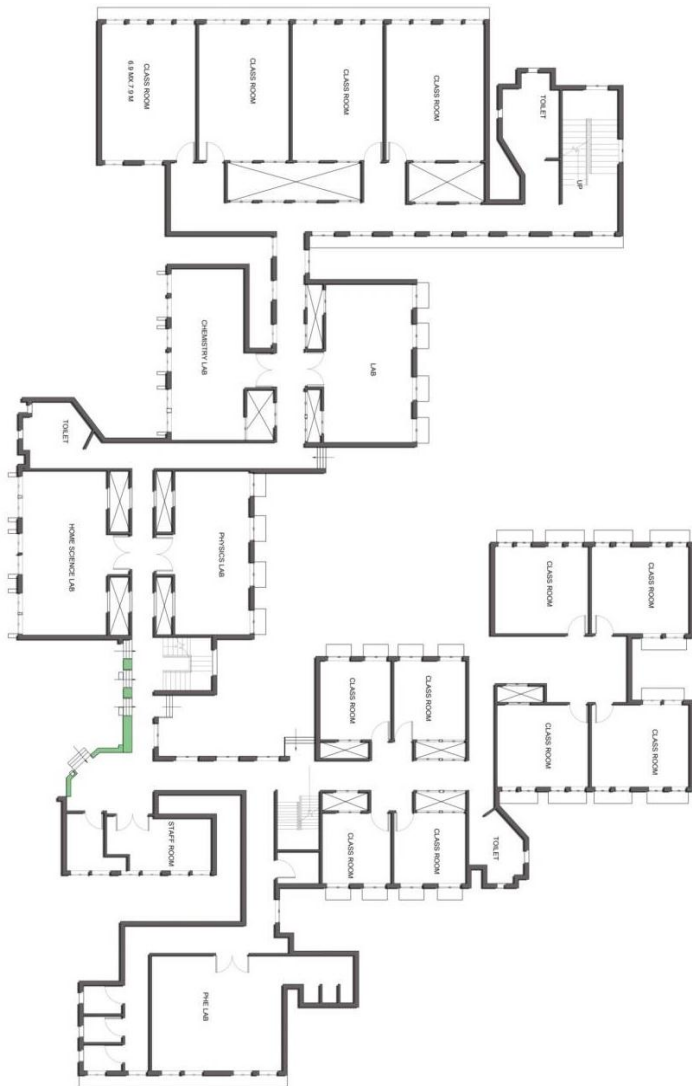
Typical floor plan of Senior Secondary School, Girls, AMU
